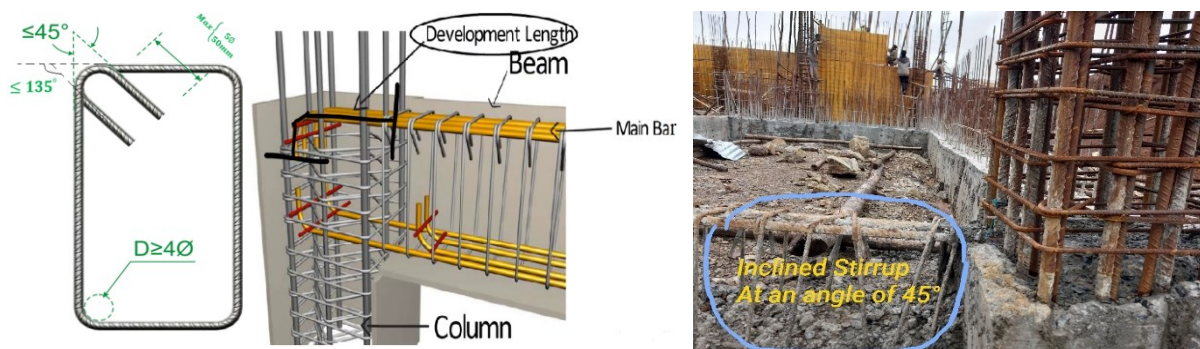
Stirrups and Bar Development [73], at Beam-Column Junctions of
